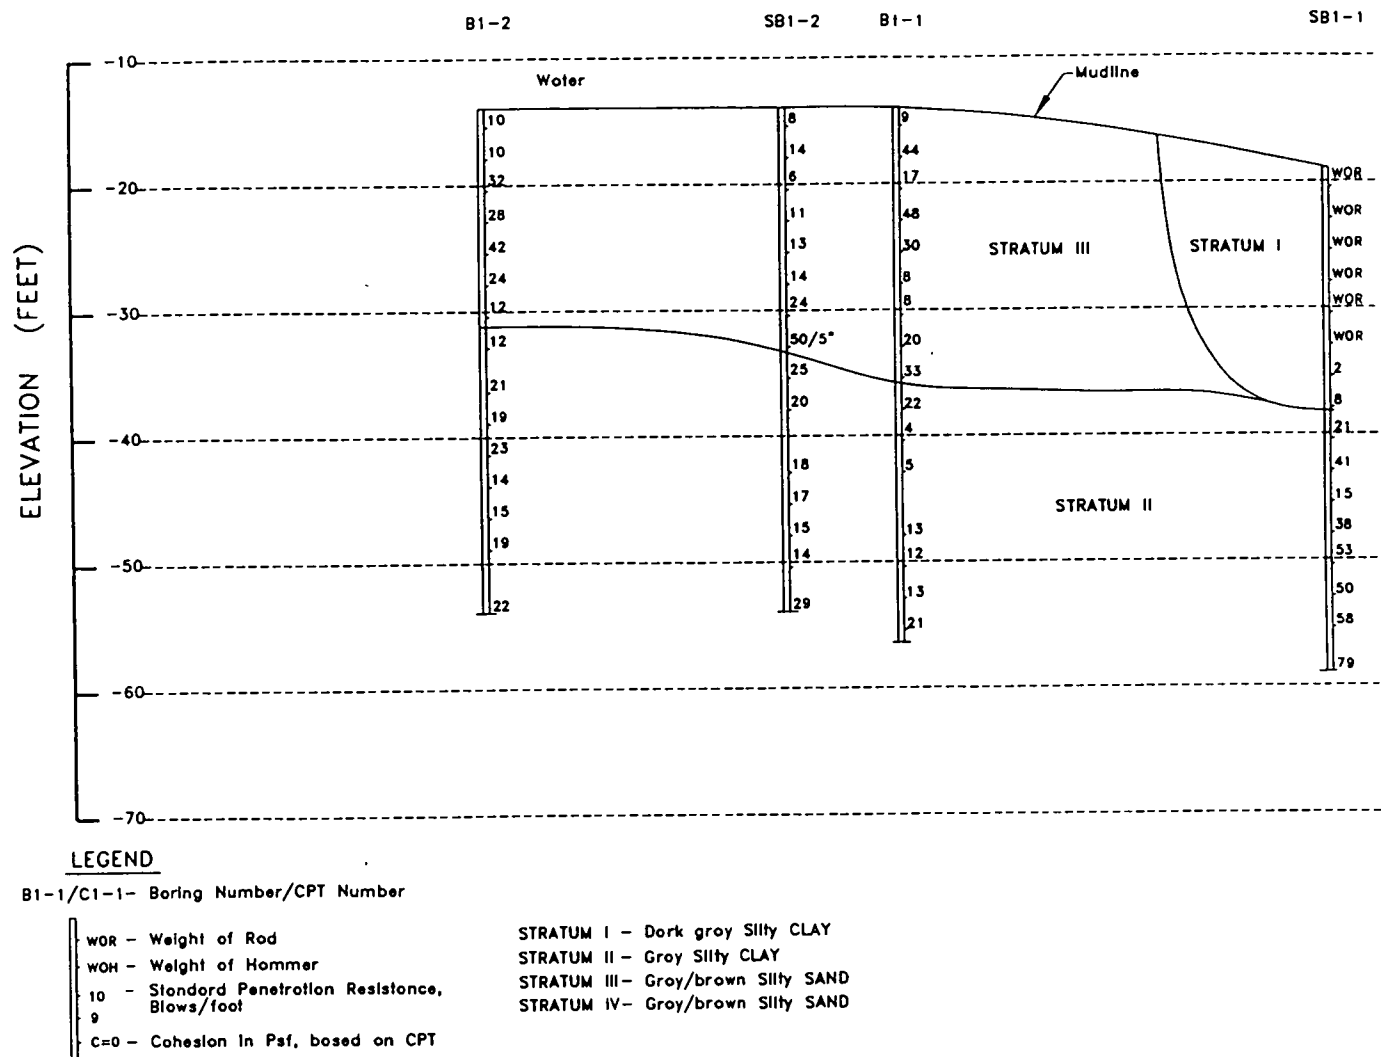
Generalized Subsurface Profile Site 1 - Section B-B
